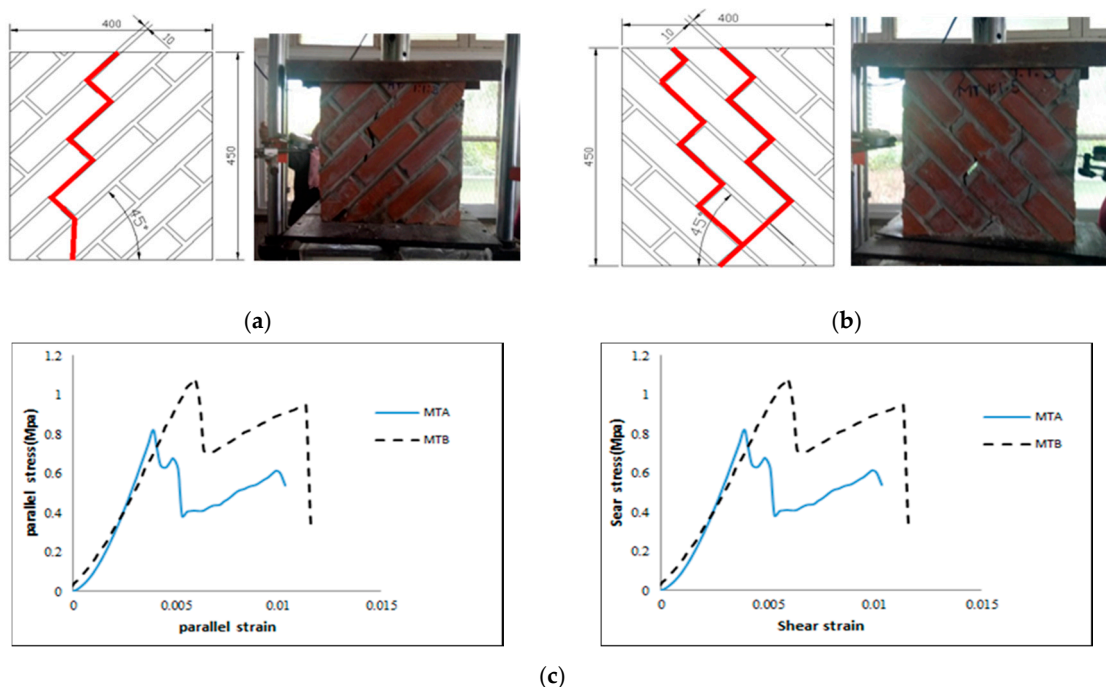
(a) Failure mode of unreinforced masonry walls 45° (MTA); (b) failure mode of unreinforced masonry walls 45° (MTB); (c) parallel and shear stress–strain relationships for masonry walls.
